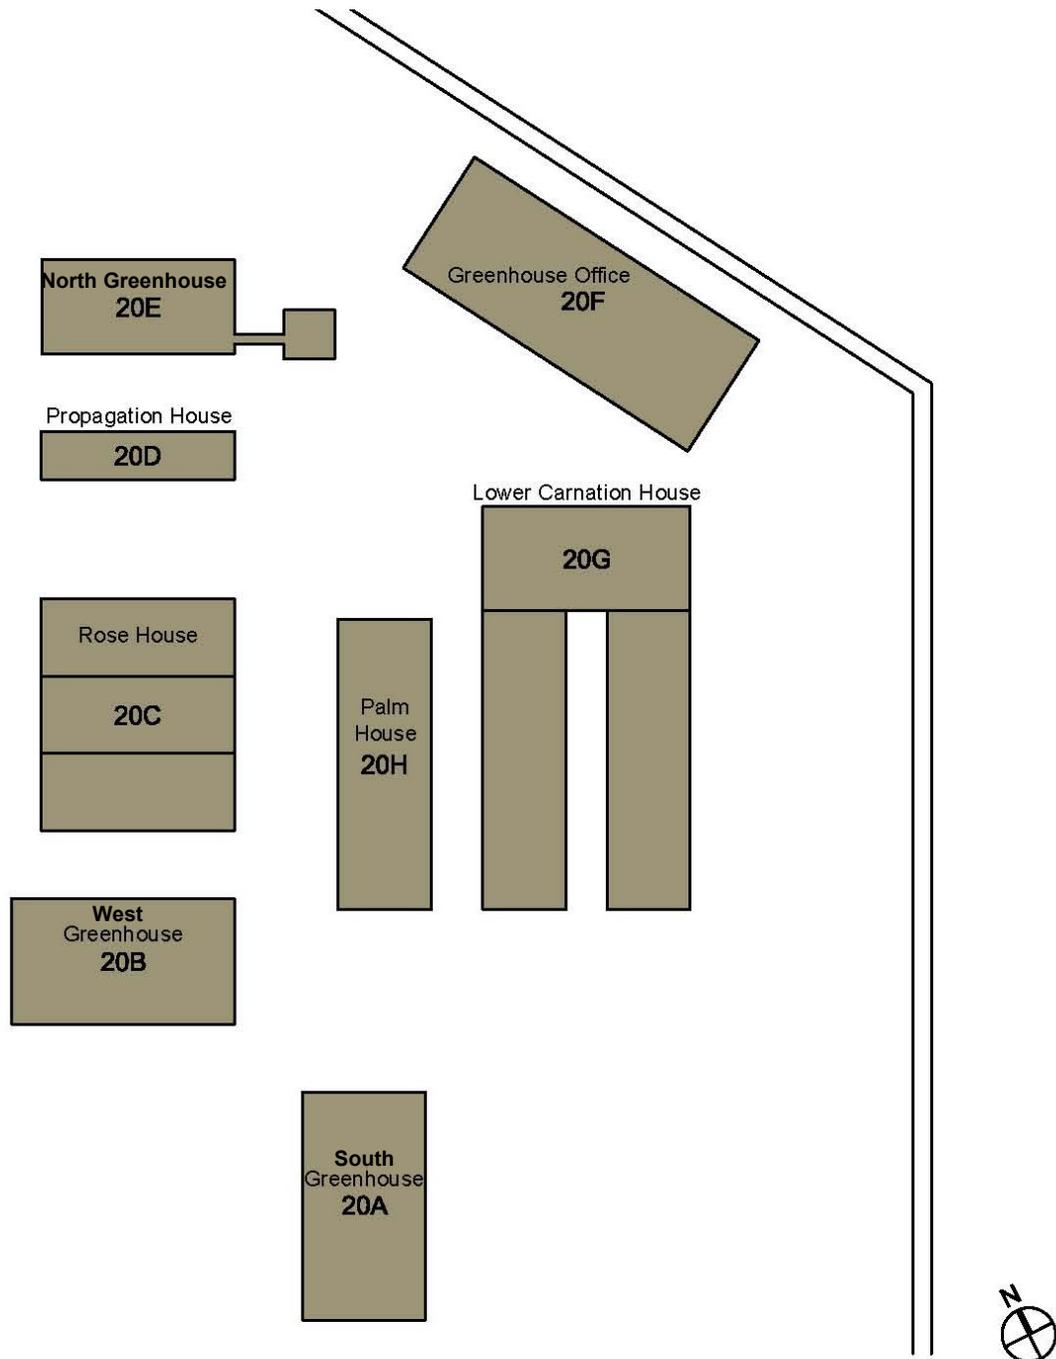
Source: Building Preservation Plan: Greenhouses (Buildings 20 A–H)
